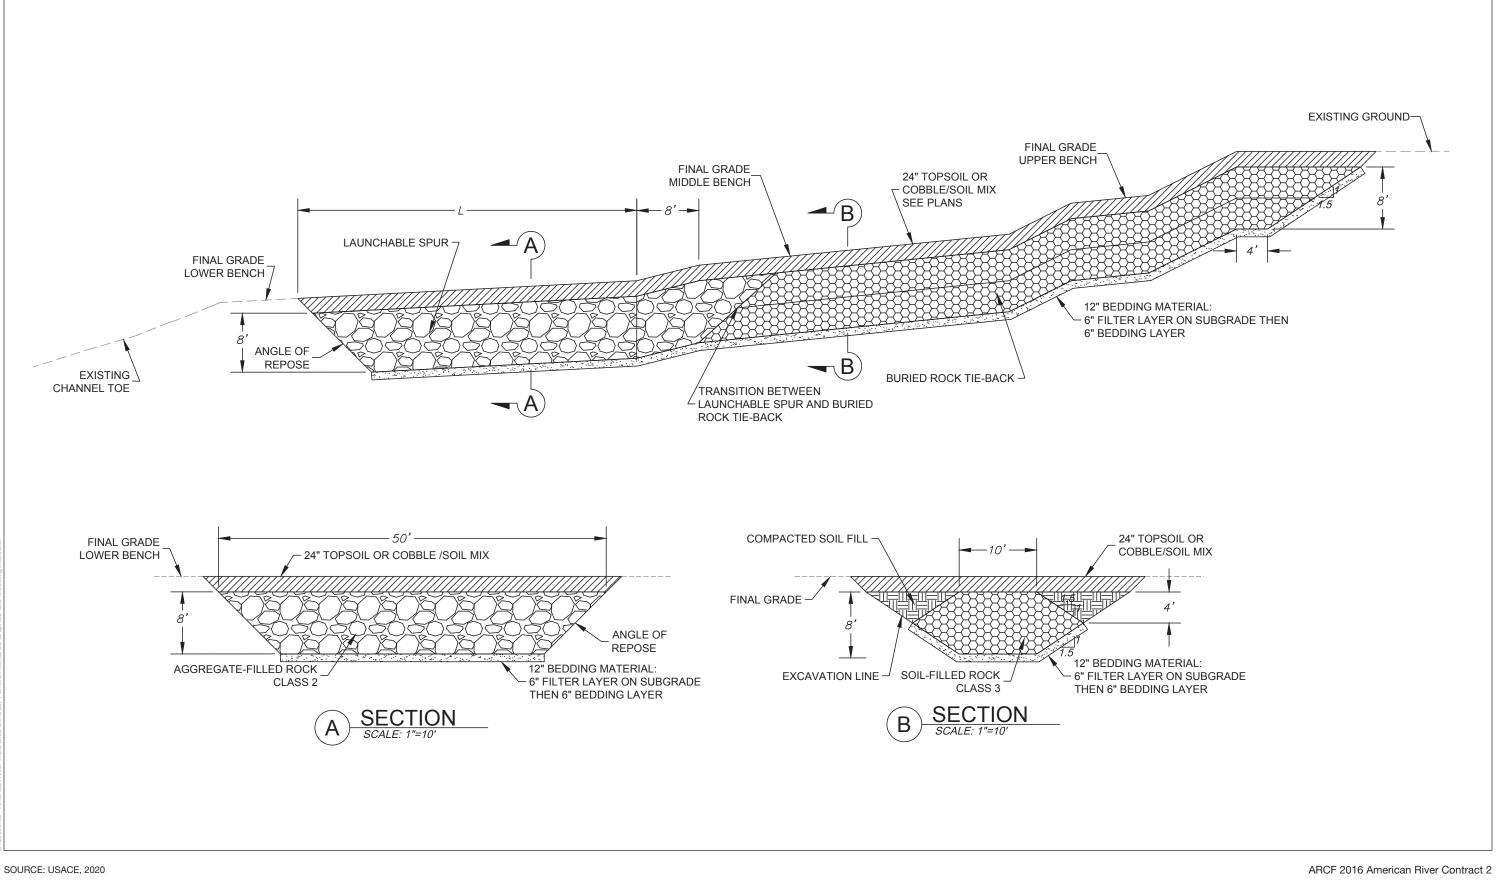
Typical Cross Section of Transverse Rock Structures at Site 2-3
